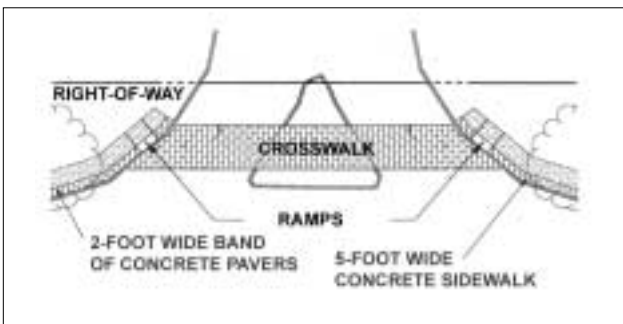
Crosswalks across driveway entrances to major retail centers and employment complexes help to highlight pedestrian crossings.
